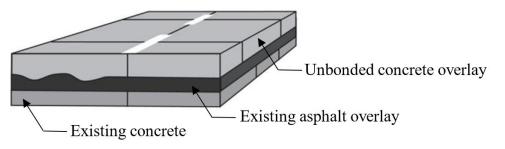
Unbonded concrete overlay on existing asphalt pavement
